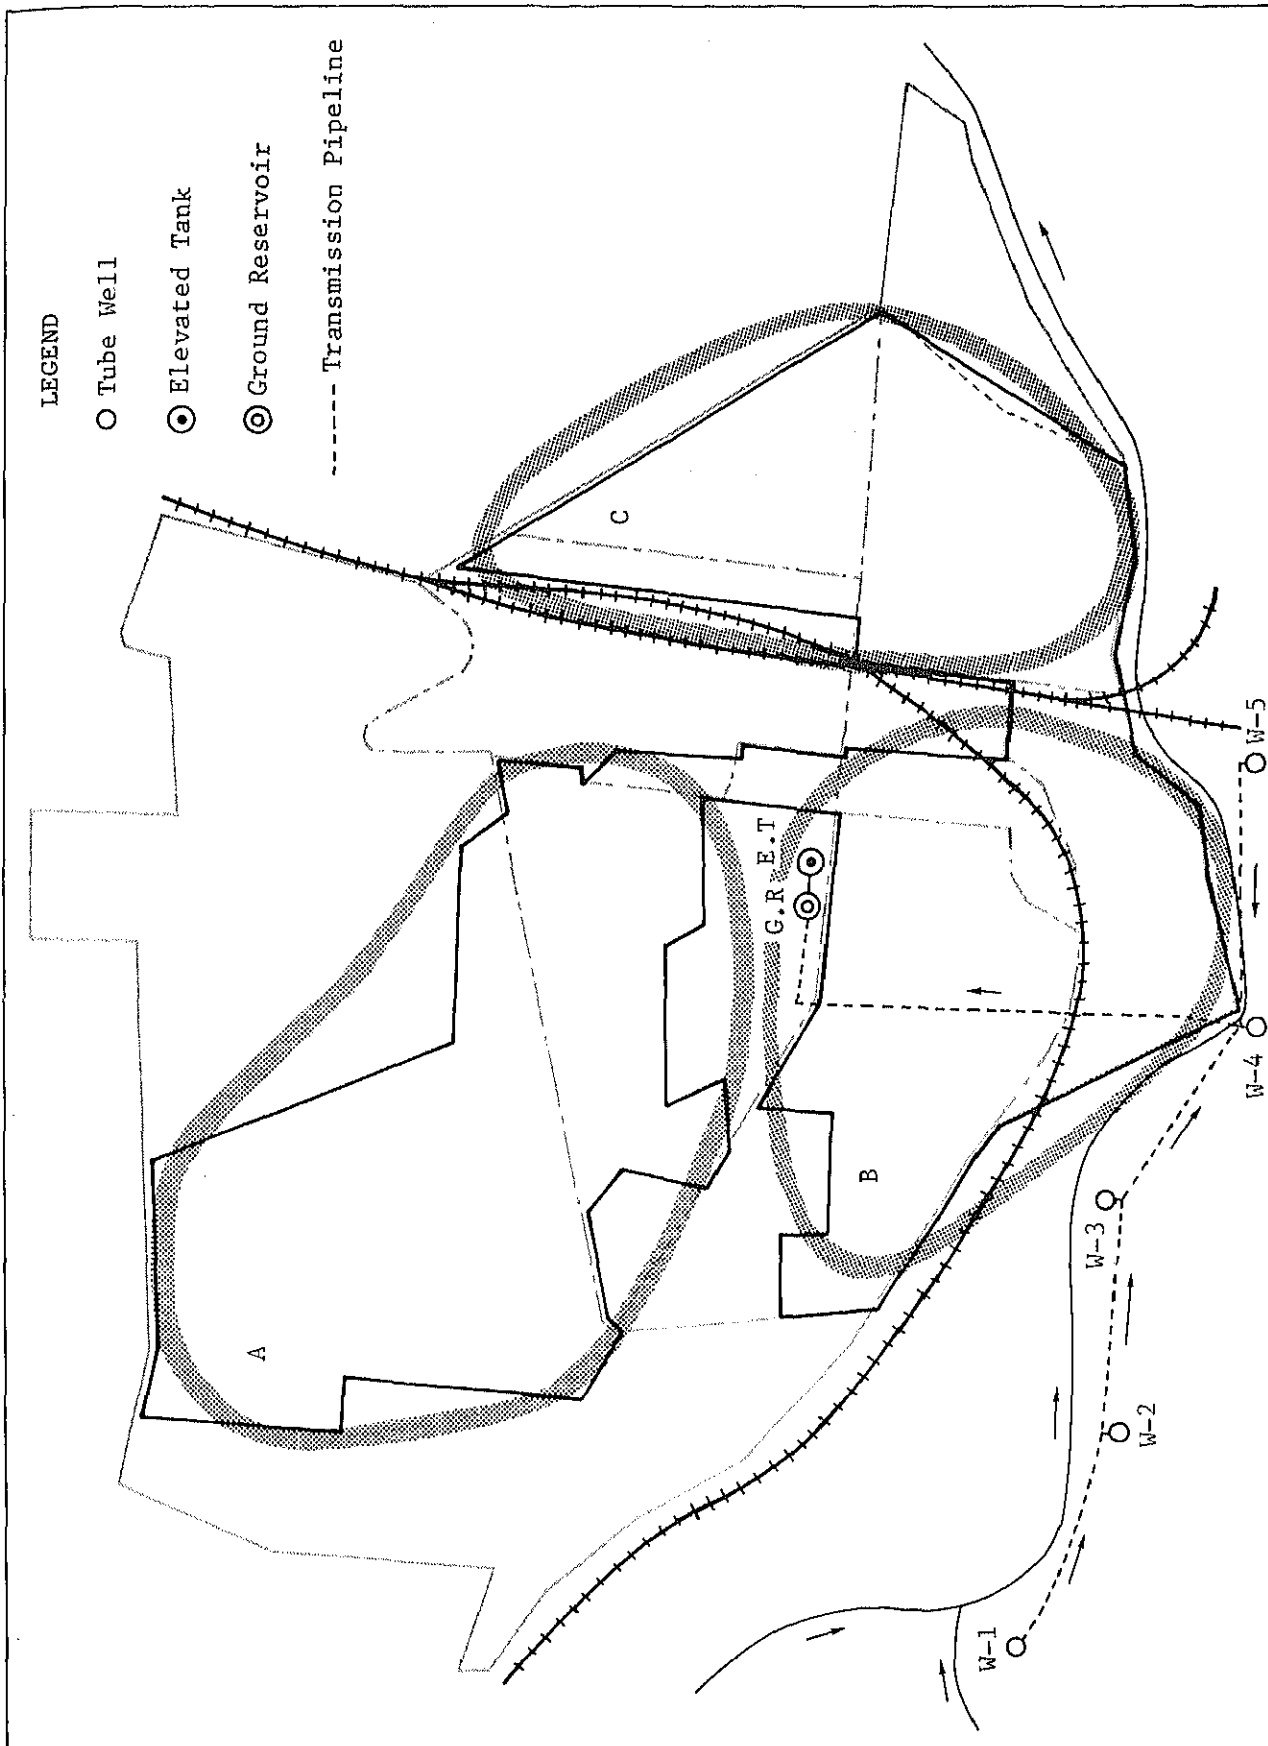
Layout Plan of Proposed Facilities
